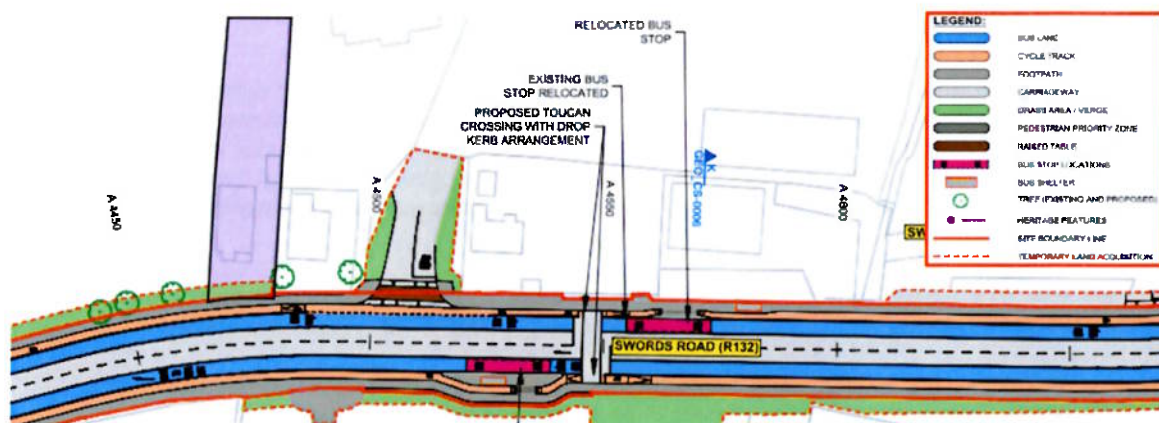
Extracts from Sheet 13 of the General Arrangement drawing illustrating the proposed works relative to our client's site (purple fill/black outline).
